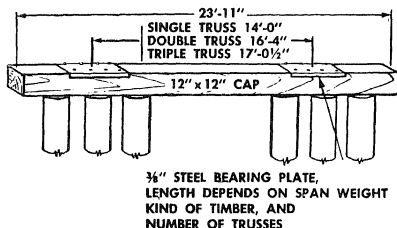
Construction of pile caps for intermediate supports under panel bridges without end posts or bearings. Cap for single timber or pile bent. Steel bearing plates provide seating for each line of trusses.
